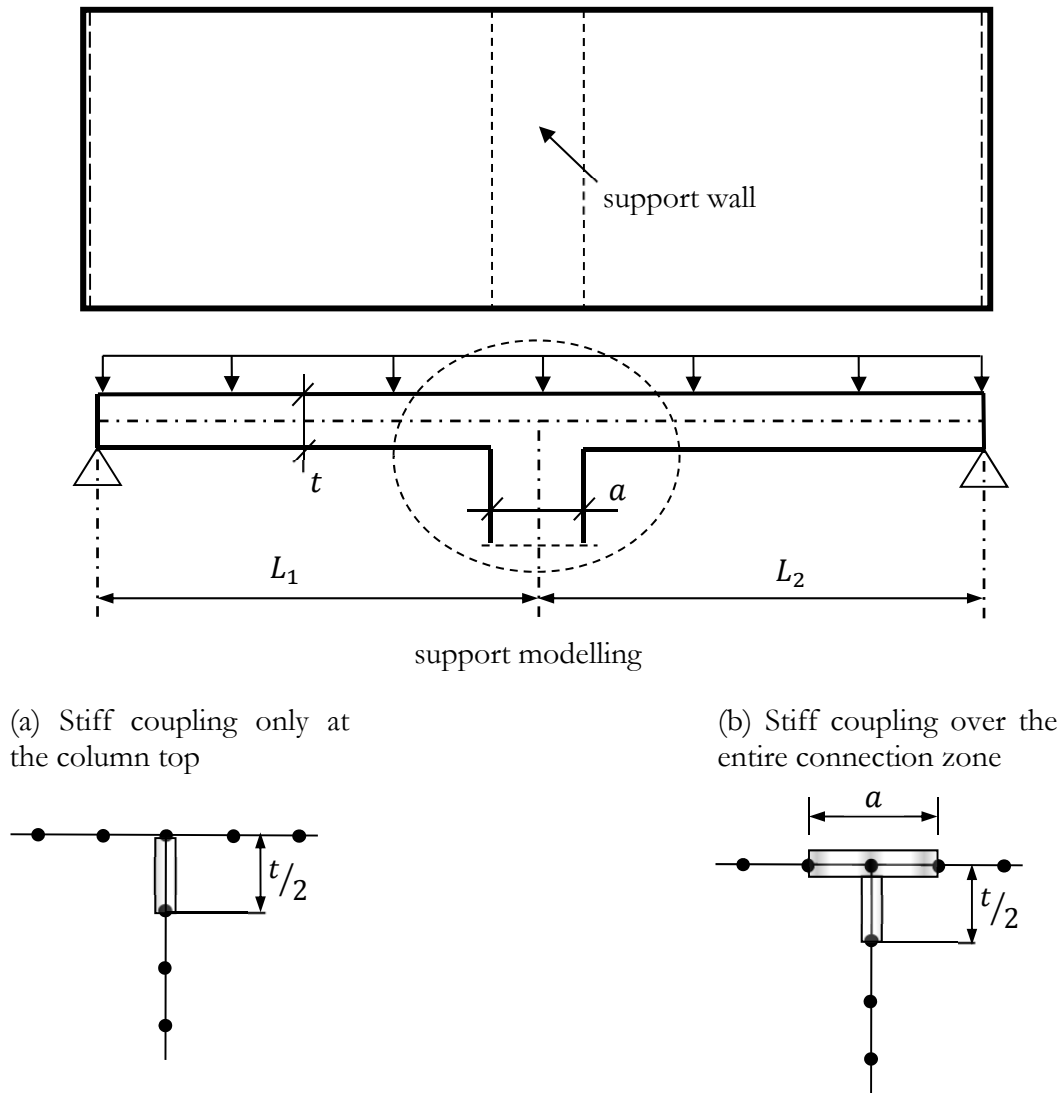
Different ways to model a monolithic connection between the slab and the supporting wall/column.
